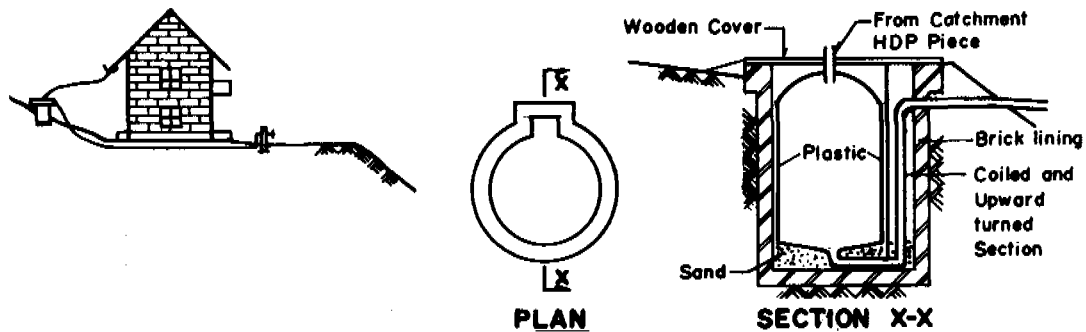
Plastic Lined Underground Rain Water Collection Tank
